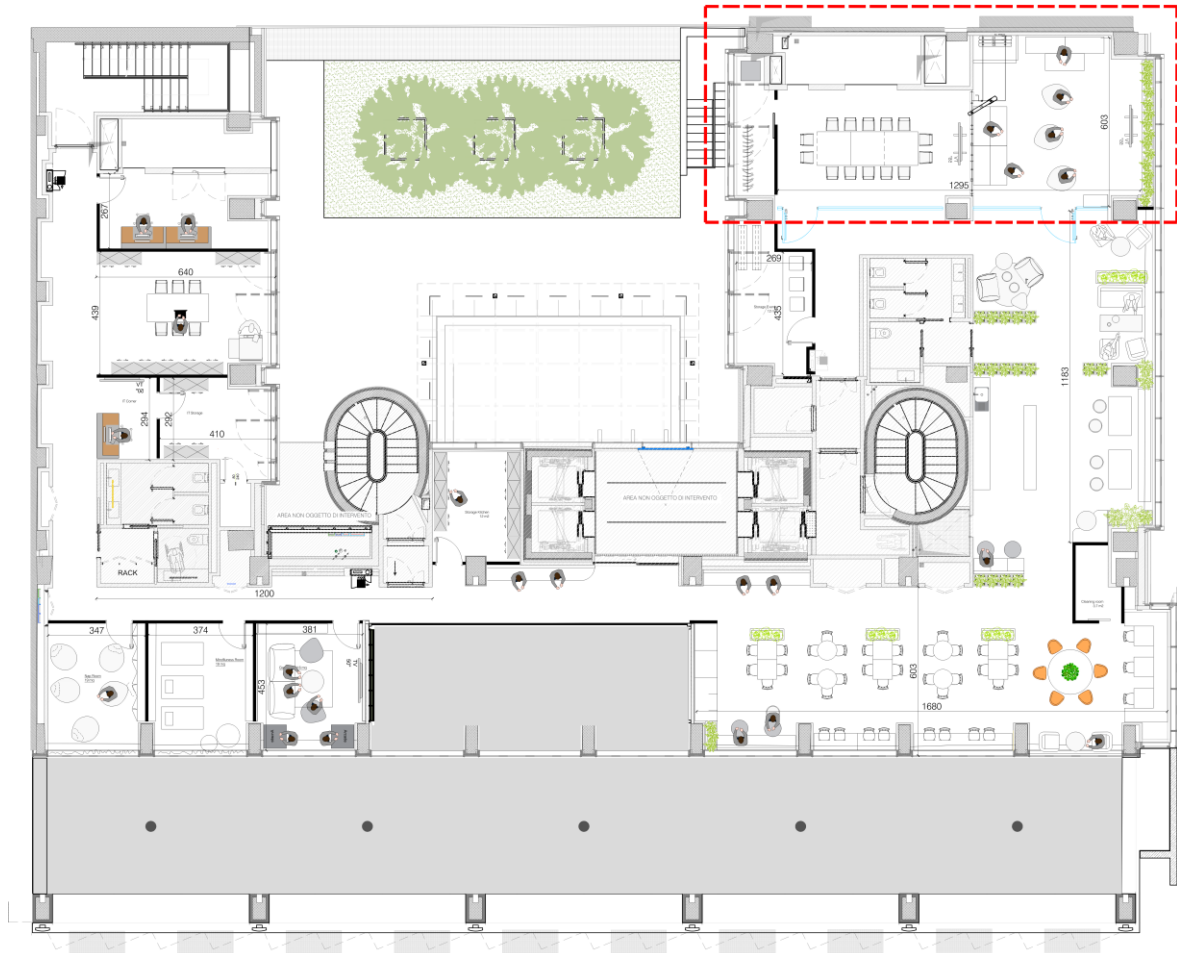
Plant layout mezzanine floor– Source: case study documentation.
